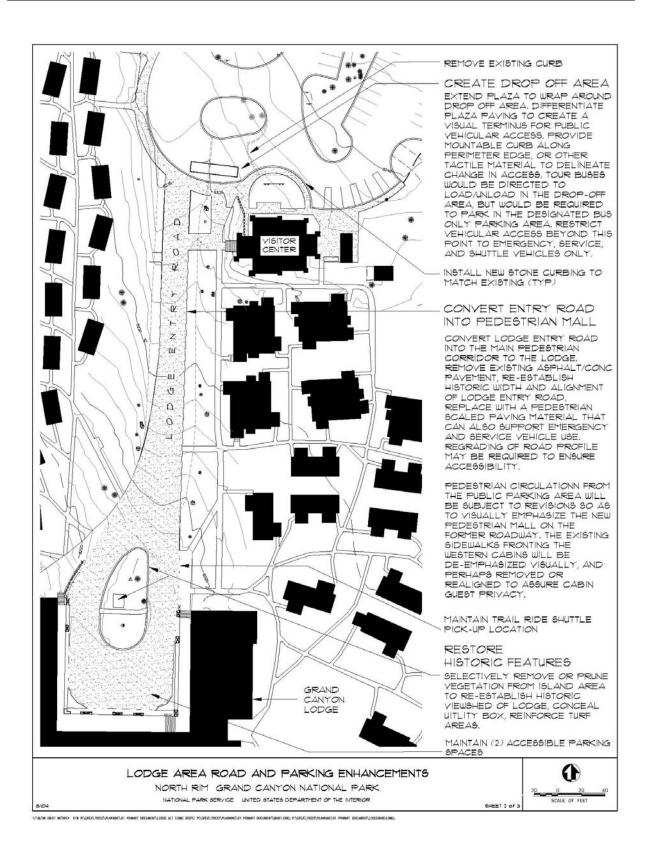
Lodge Area Road and Parking Enhancements, Lower Parking Area
